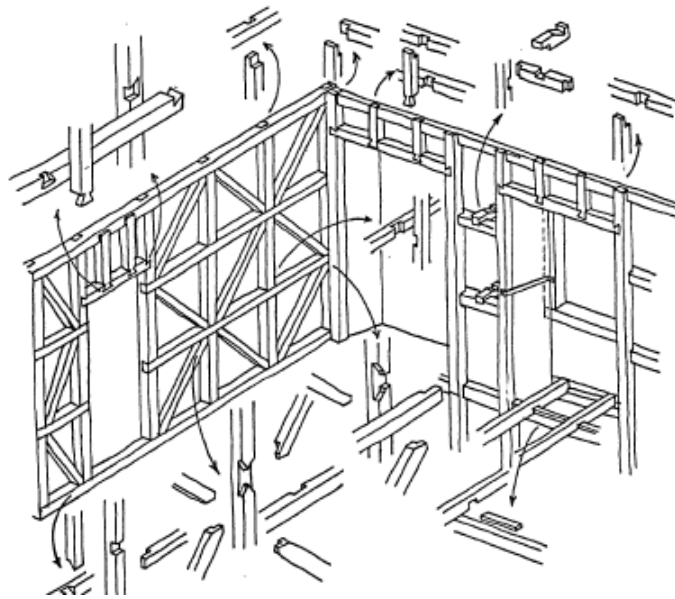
Configuration and structural details of dovetail connections in a “Pombalino” structure [16].
